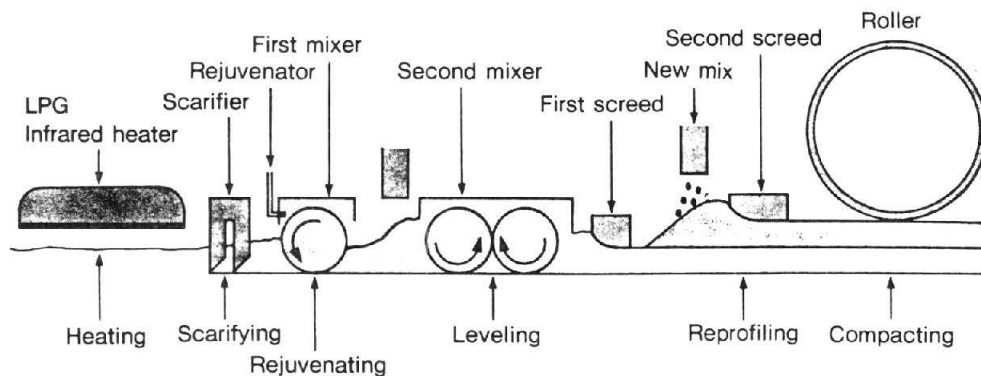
Repave method. After the old existing asphalt pavement materials are mixed with rejuvenator and/or new asphalt mixture, new hot asphalt mixture is overlaid, leveled, and compacted as in conventional overlaying process. (Courtesy of Taisei Road Construction Company)
